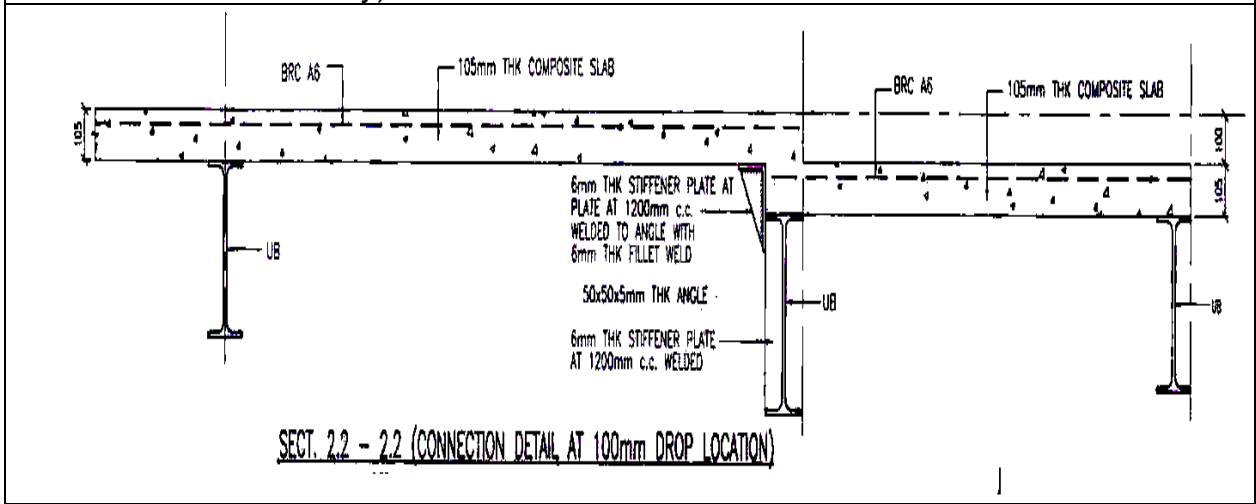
Connection details for 100mm drop in slab (details and sizes shown are indicative only)
